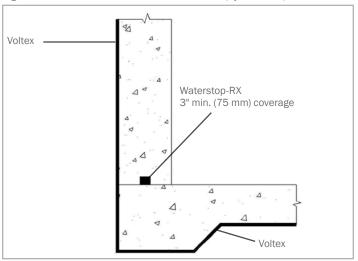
Flush slab detail property line wall (hydrostatic)
